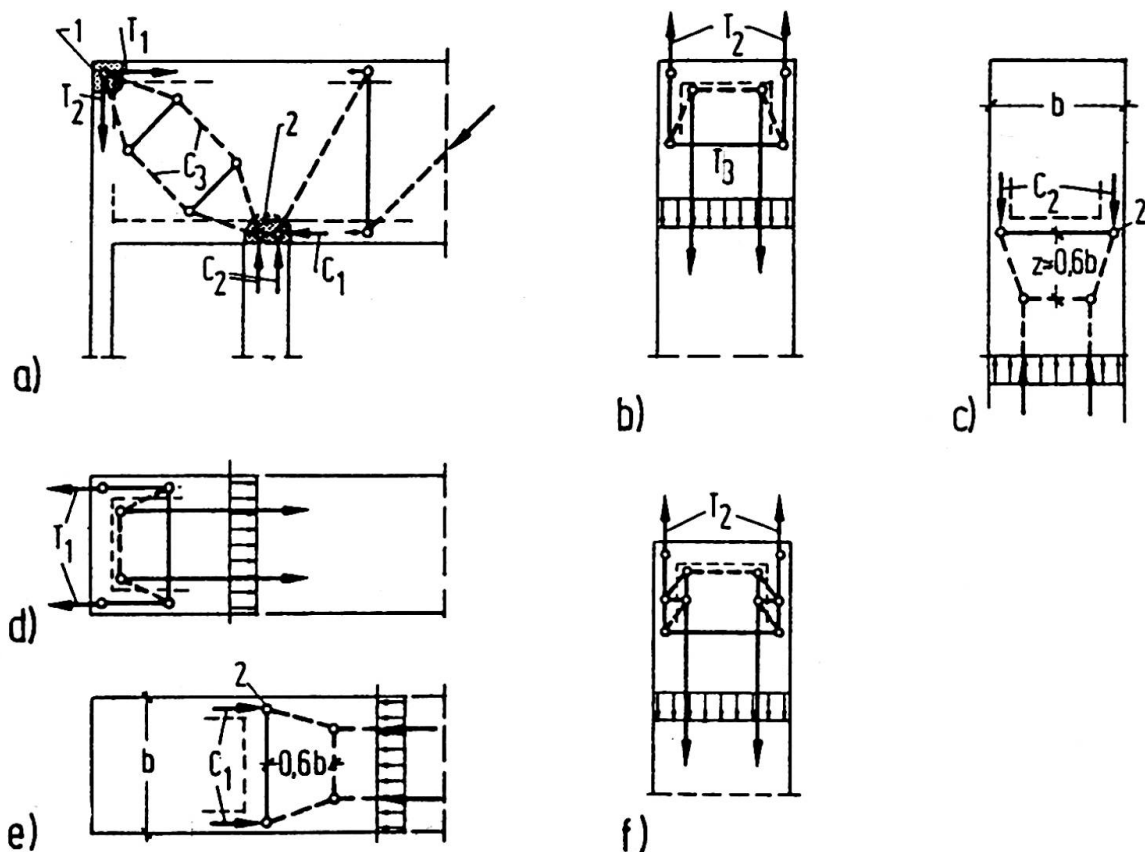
Strut-and-tie models for the structure without internal diaphragm wall. a) Web; b) tensile wall; c) compression wall; d) top flange; e) bottom flange. f) Refined model for the lap problem characterized in Figs. b and d
